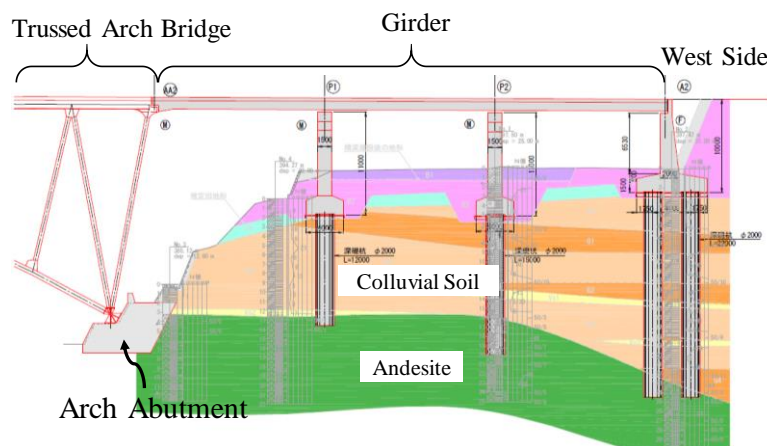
Ground condition at arch abutment and continuous girder section (modified from Ref. [3])
